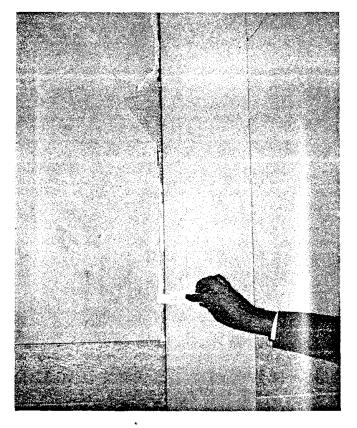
PERMANENT DISPLACEMENT OF APPROXIMATELY 1 INCH AT THE SIXTH FLOOR LEVEL OF BUILDING 3B
